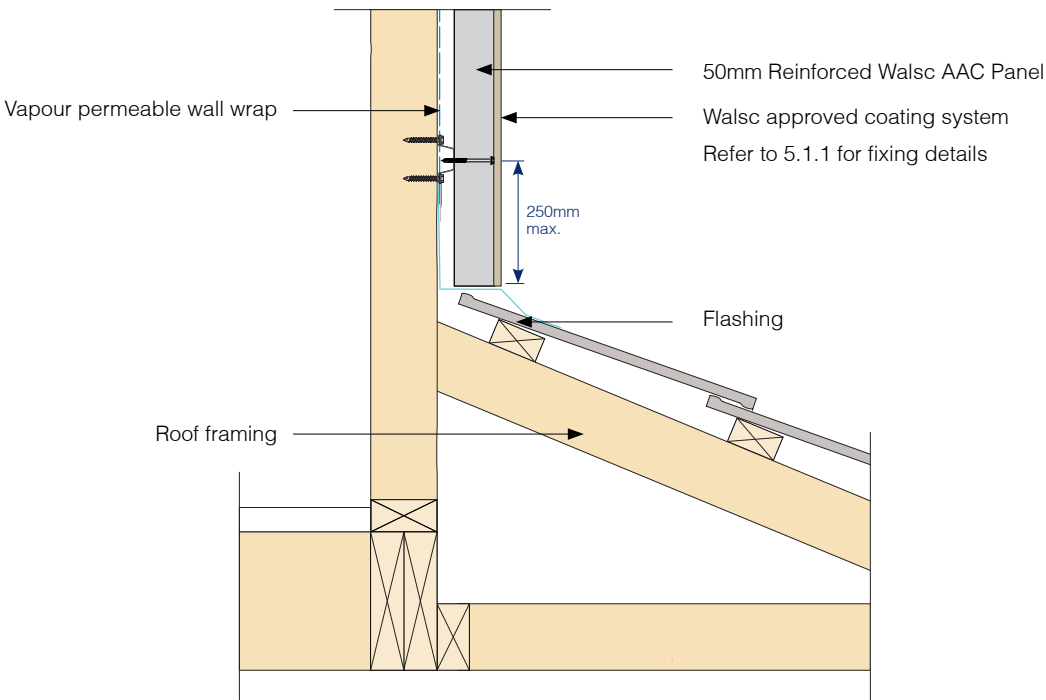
Panel to Roof Junction Detail (Option 2)
